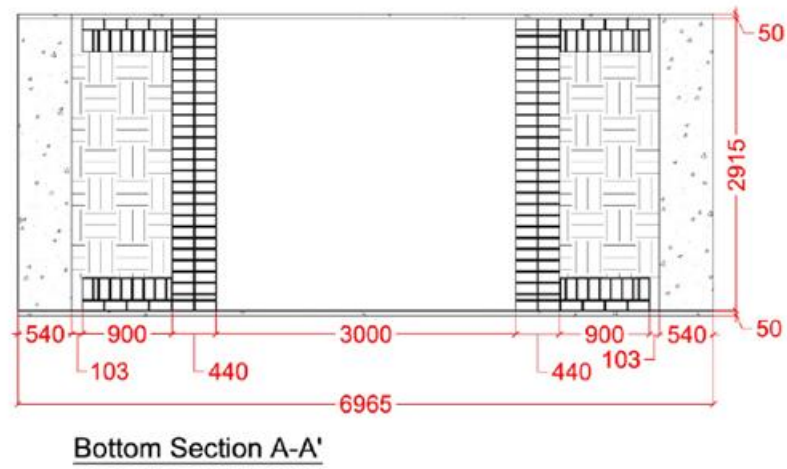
Dimensions of the test bridge section A-A' (mm) (Sarhosis et al., 2024)
